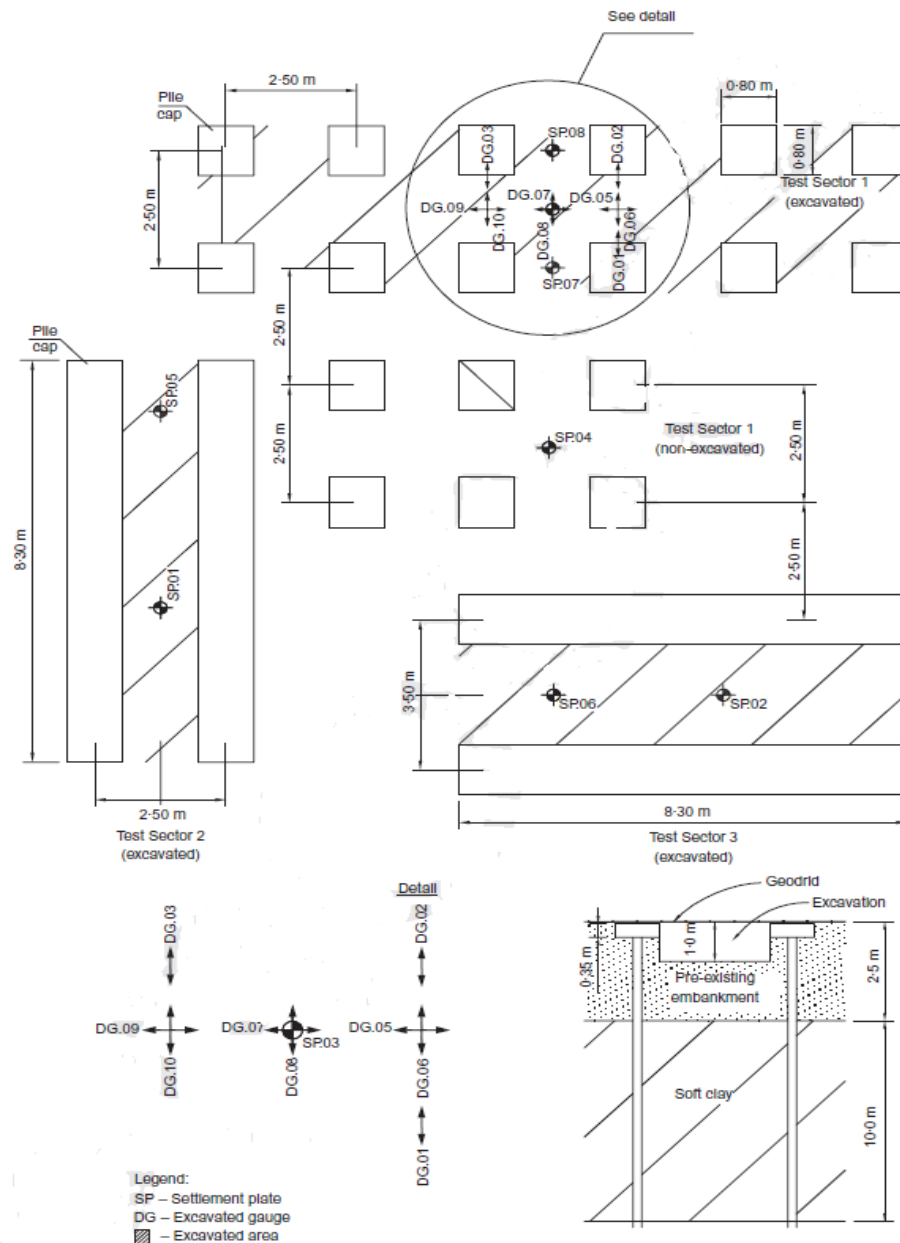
Layout of field test at Barra da Tijuca district in Brazil (after Almeida et al., 2008)
